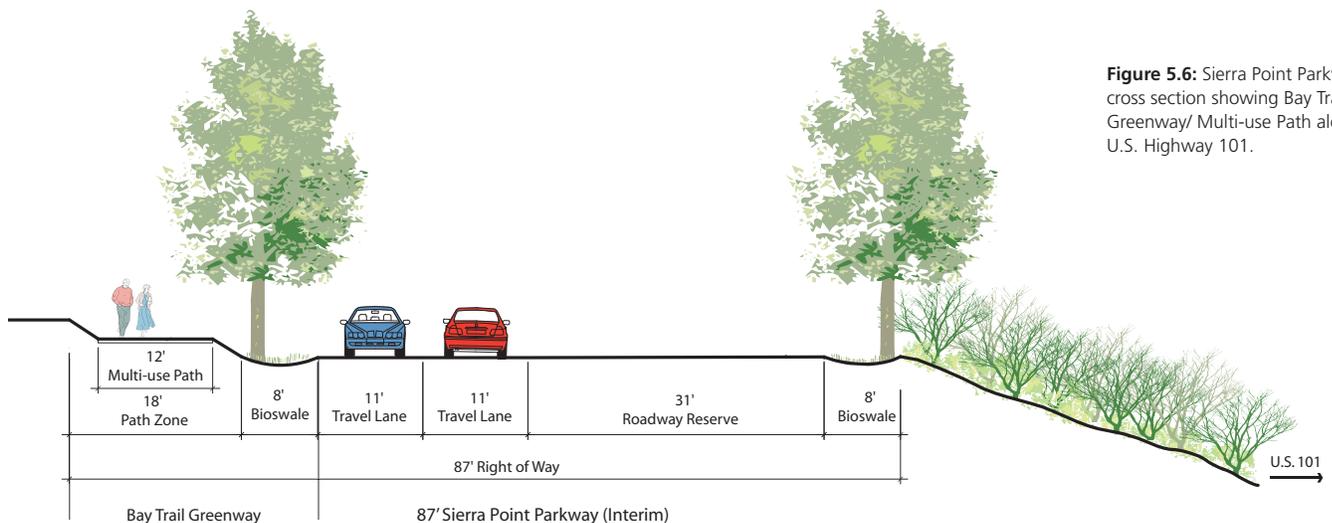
Sierra Point Parkway cross section showing Bay Trail Greenway/ Multi-use Path along U.S. Highway 101.
